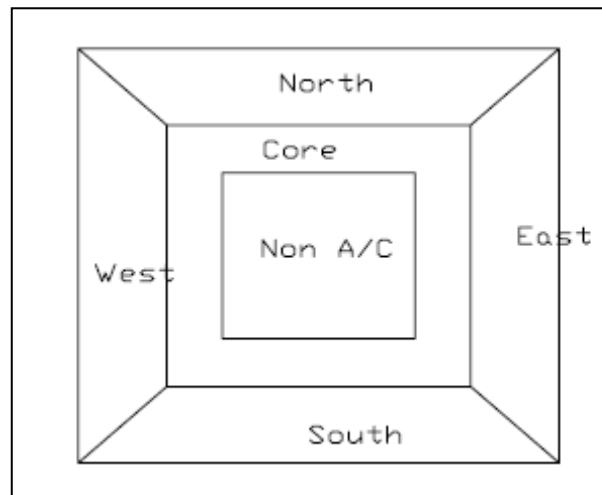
Plan view of the Malaysian Base Case building with 10 floors
